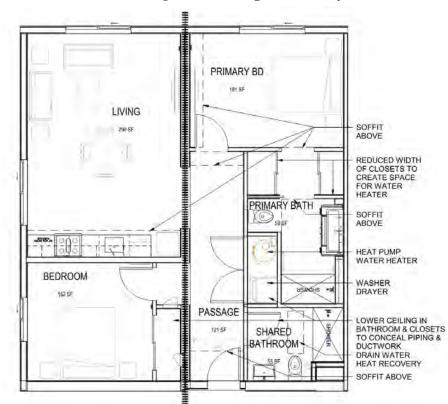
Two-Bedroom Apartment Using Two Factory-Built Modules
